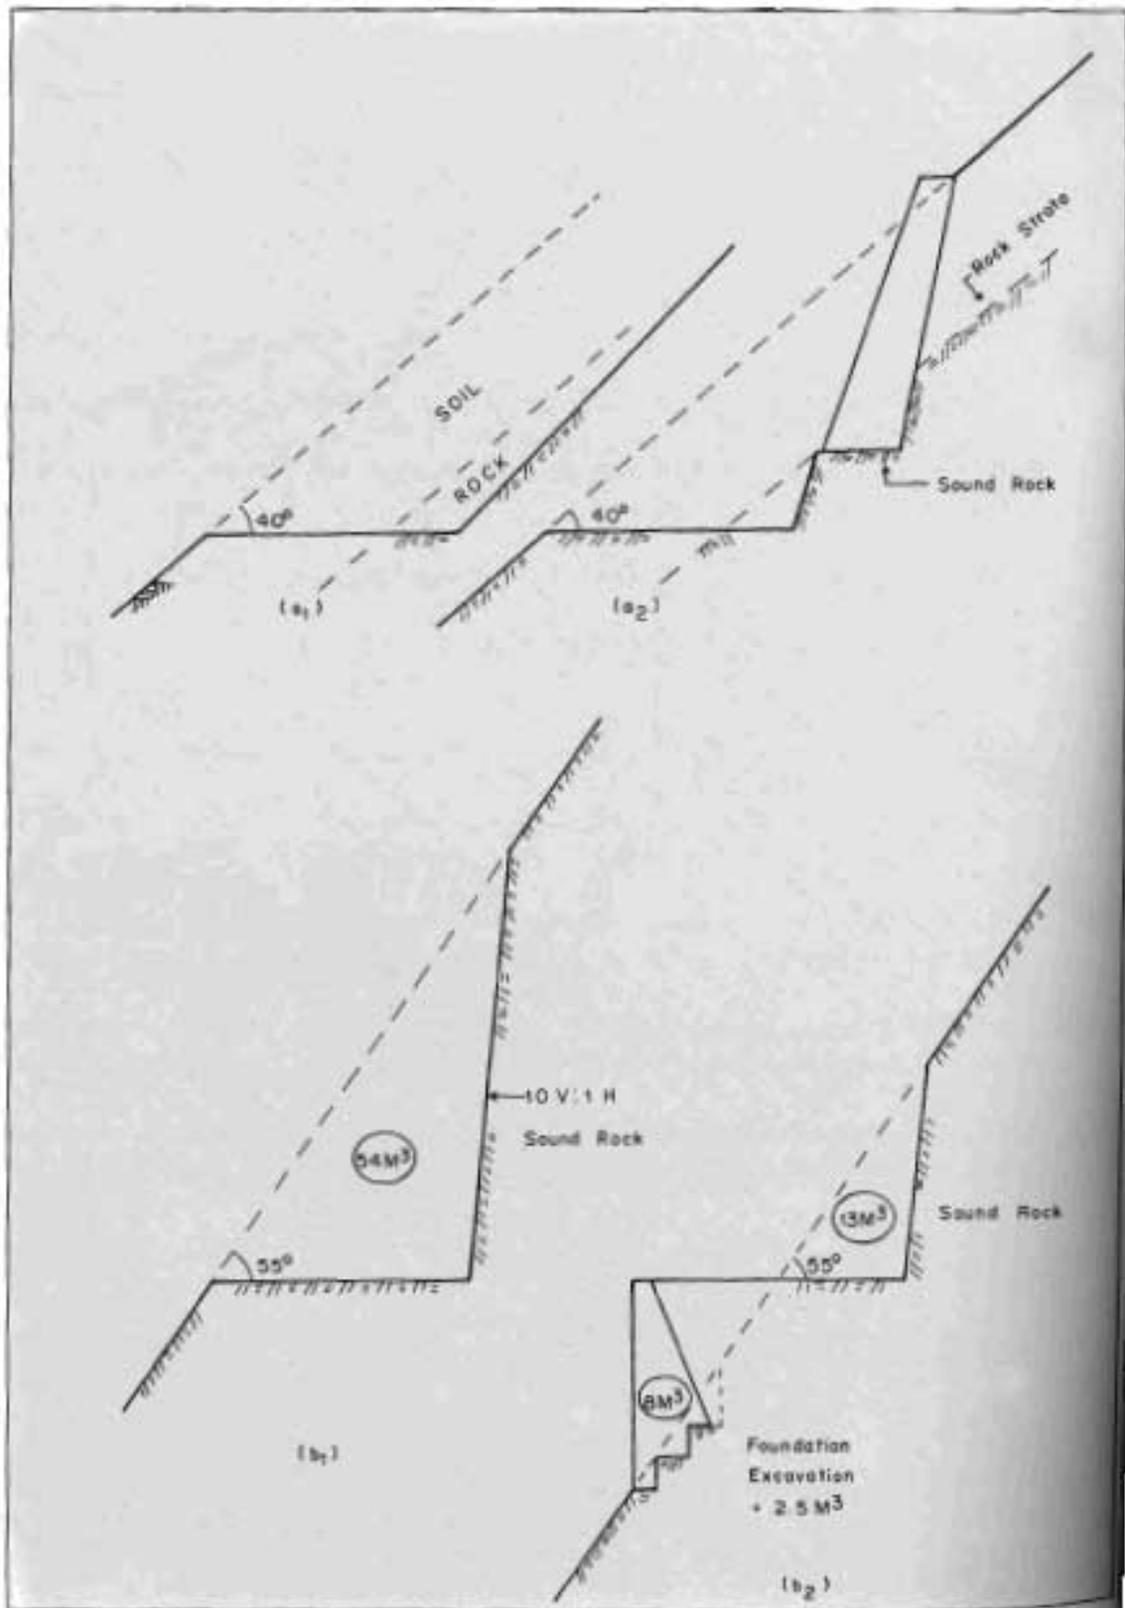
Minimizing height of cut in rock and soil areas and rocky areas
